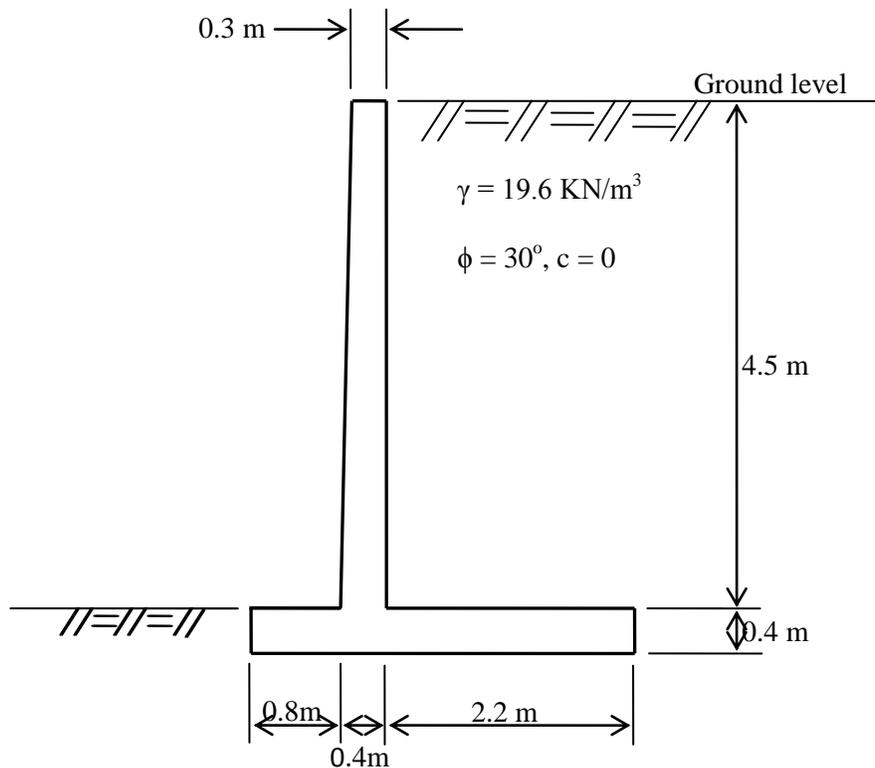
Schematic of reinforced concrete cantilever retaining wall
